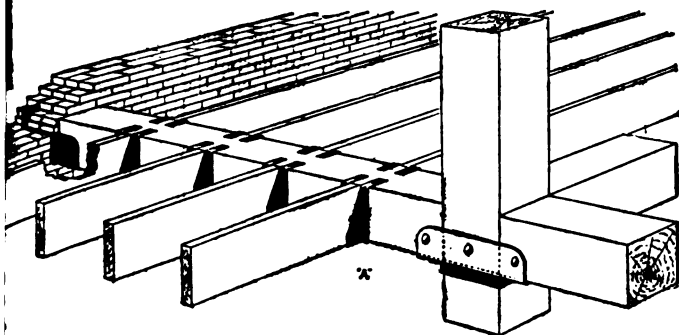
Floor-framing with Van Dorn Hangers and Post-caps
